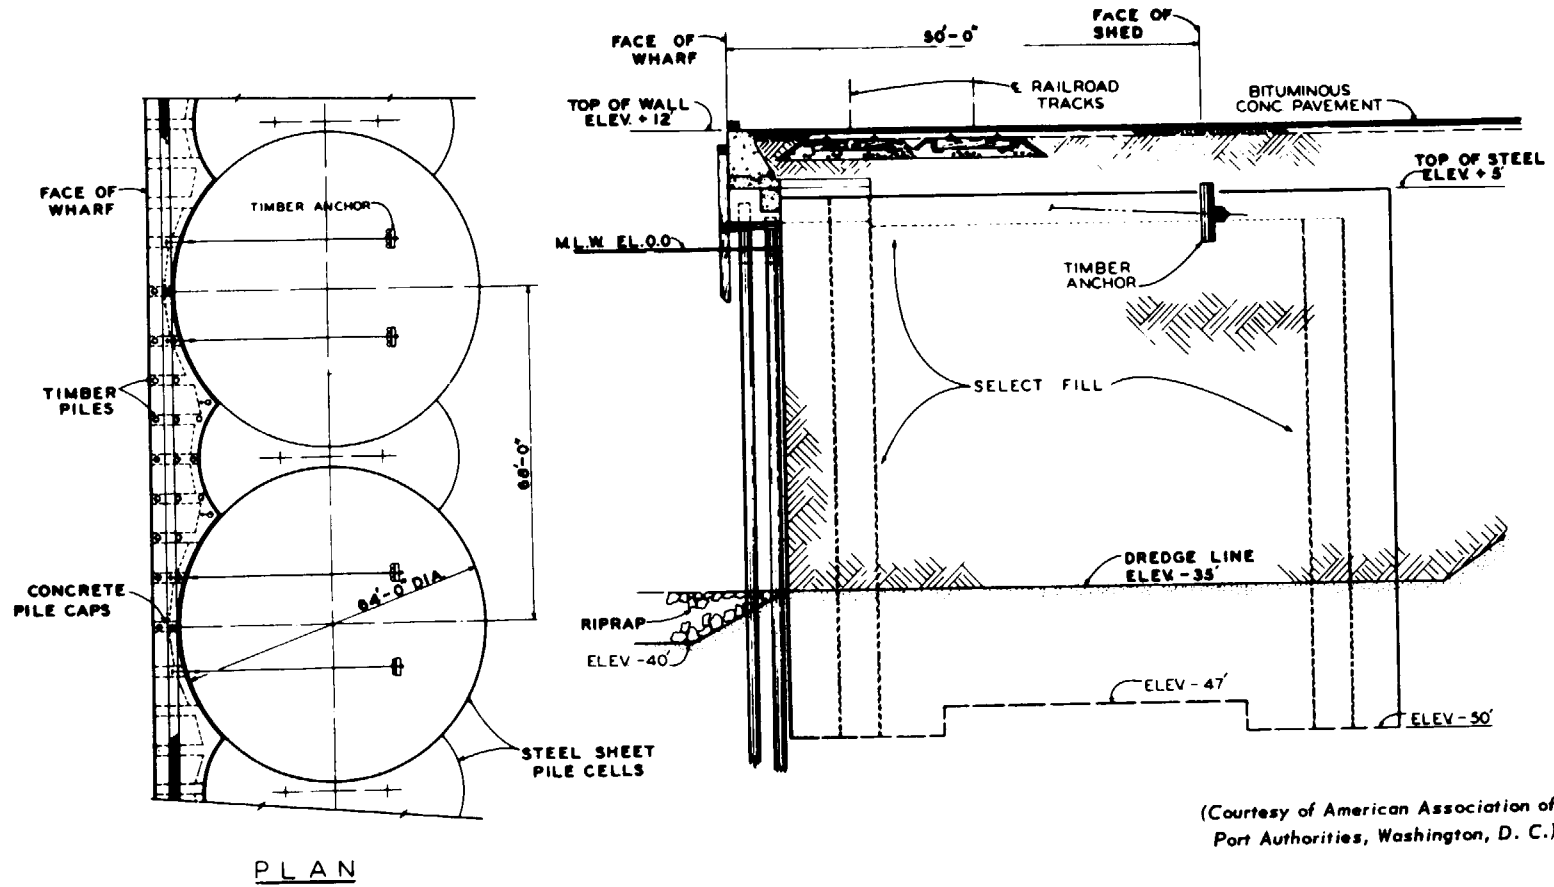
Solid fill-type wharf construction with circular steel sheet pile cells.
